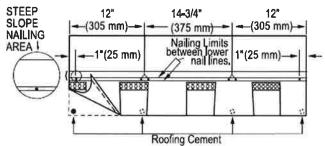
Use six nails and four spots of asphalt roofing cement on steep slopes.
